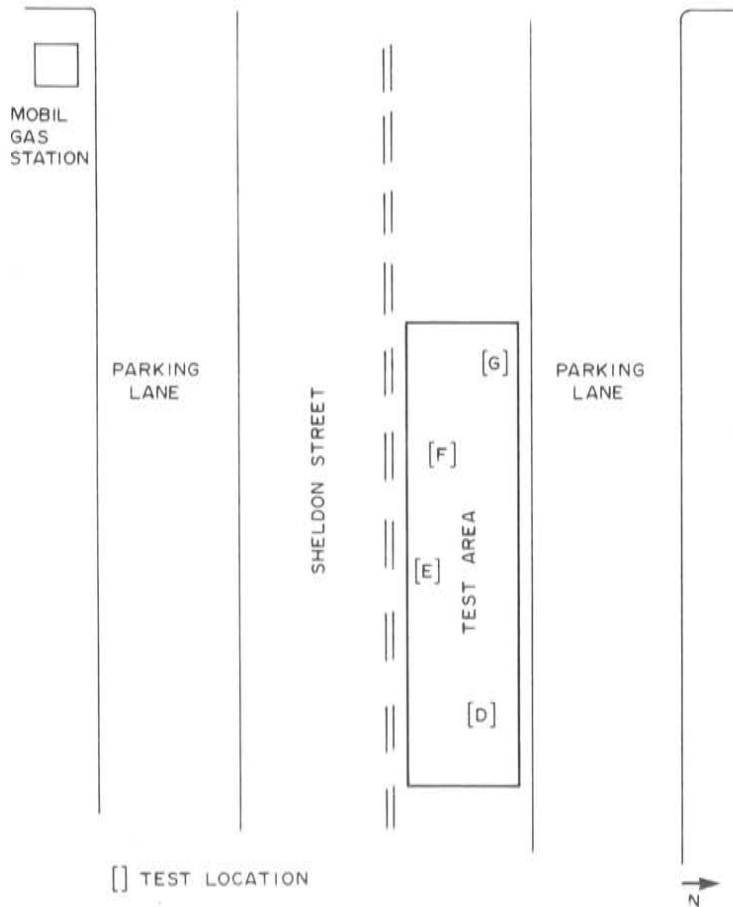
LOCATION OF TEST SECTION, SHELDON STREET #2
